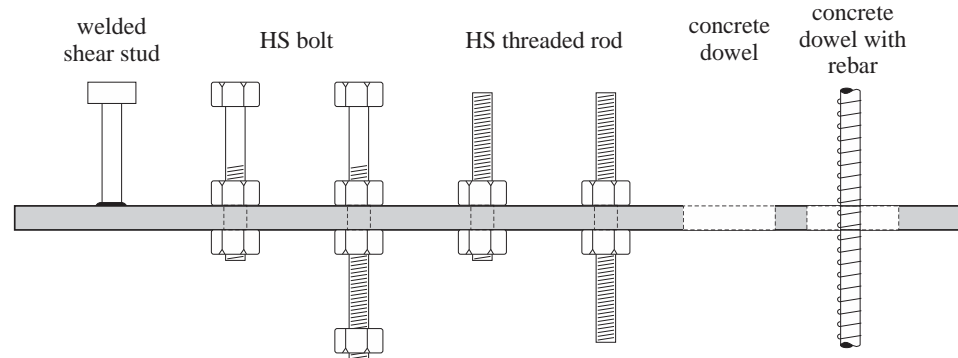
Alternatives to Welded Shear Stud Connectors
